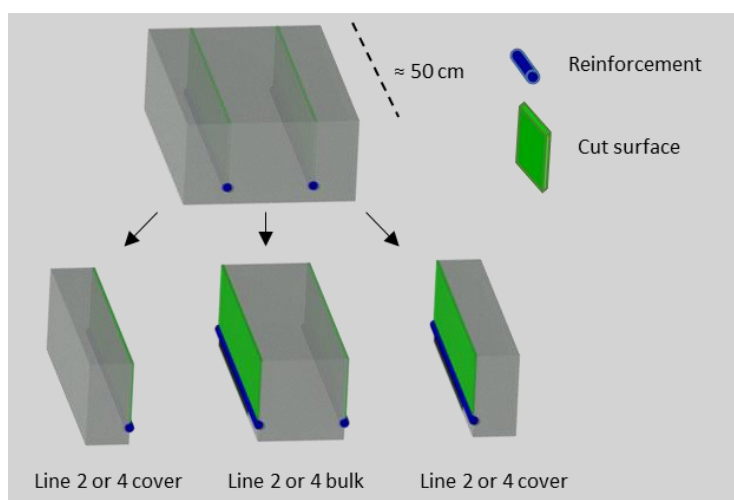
Illustration of cutting and splitting the concrete beams. 50 cm long sections of the beams were first longitudinally cut to a certain depth (green section) and afterwards opened using hammer and chissel
